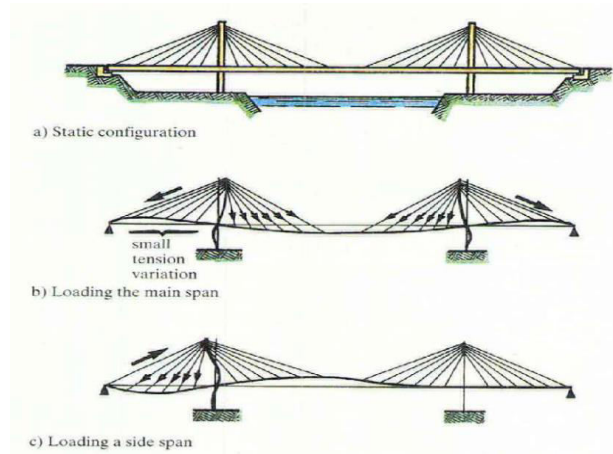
Behavior of Classical Three Span Cable Stayed Bridge [2]
